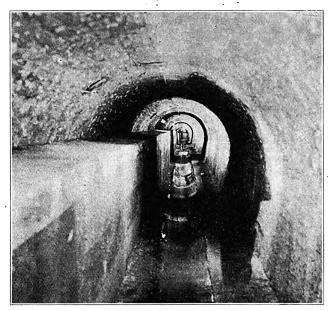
Duct Line Laid and Cemented in Tunnel of Concrete.
